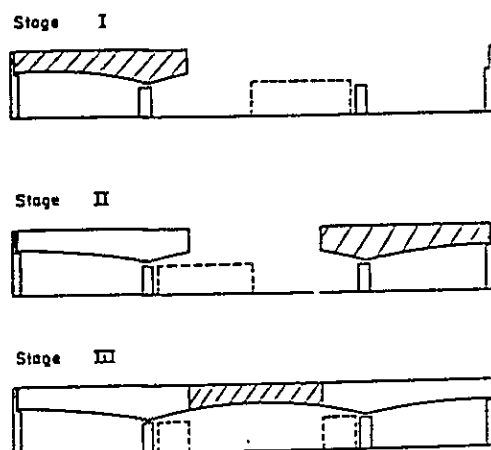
CONSTRUCTION STAGE AND DETOUR PLAN DURING CONSTRUCTION
